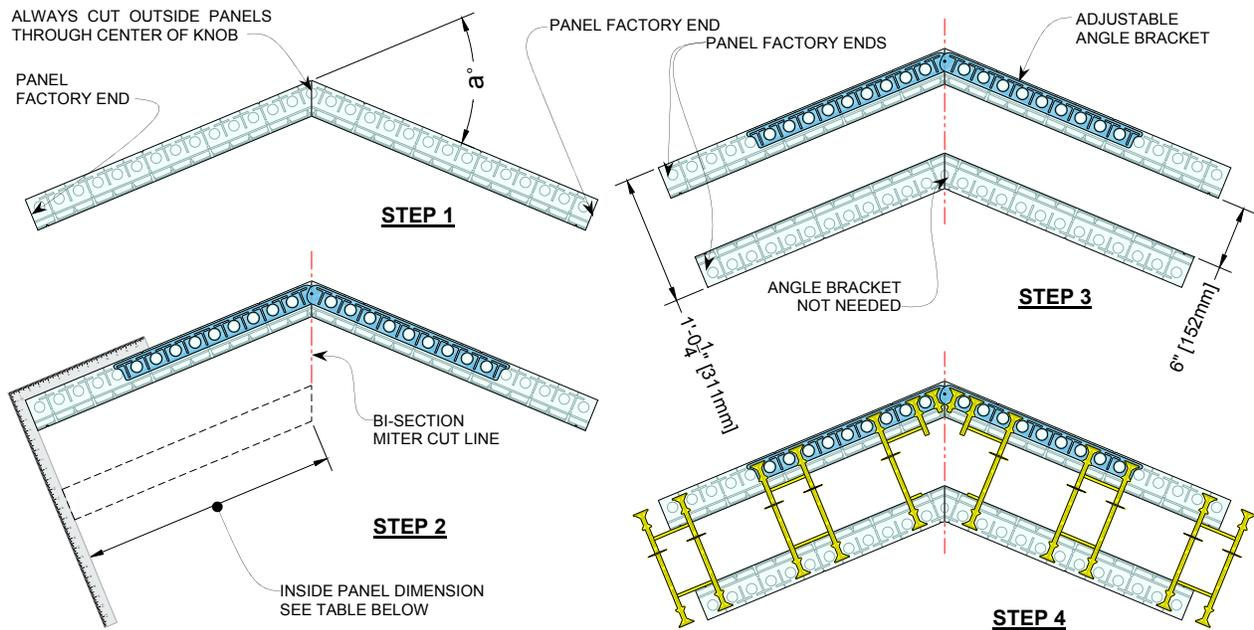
Angled Wall Cutting, Bracket & Tie Placement (Imperial)
